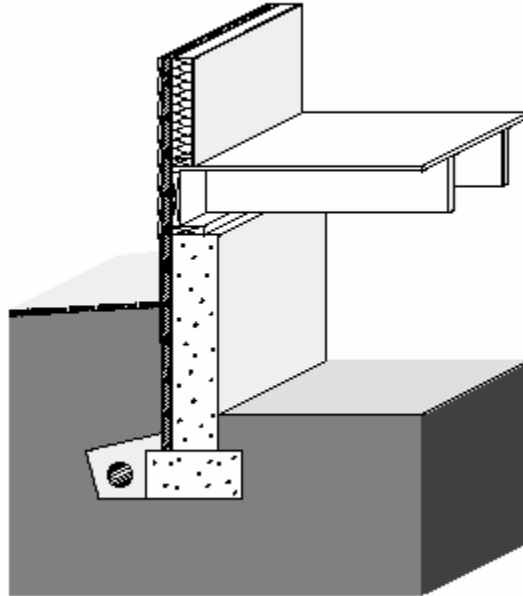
Concrete Crawl Space Wall with Exterior Insulation
